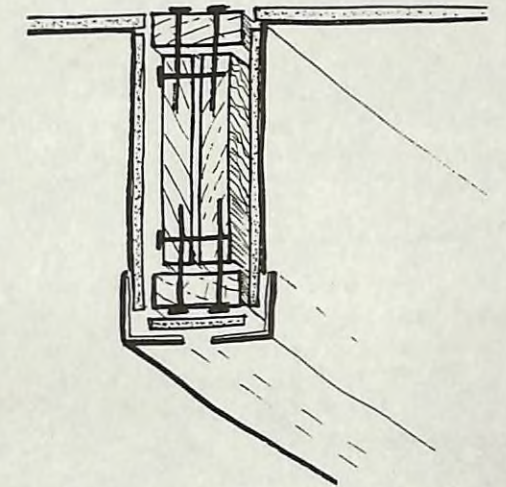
The best way to prevent drywall problems on a drop beam is to make the corners float. Use small headed nail (tape & fill over) and glue on the corner beads. A plywood or wood block at bottom of beam also helps prevent wood members from twisting or warping.
